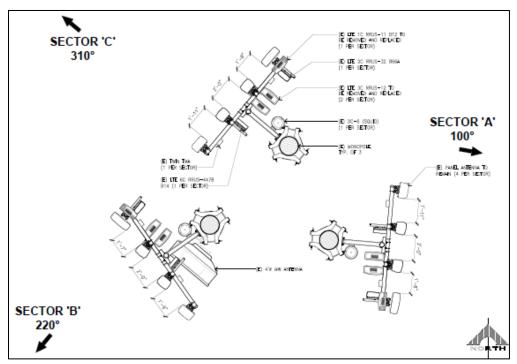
Existing antenna layout plan (Source: Plans, page A-3, panel 1).
